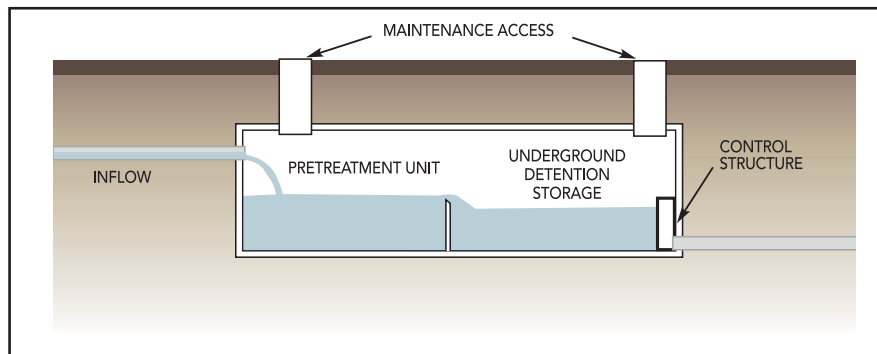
Schematic of Reinforced Concrete Structure used for Underground Detention
